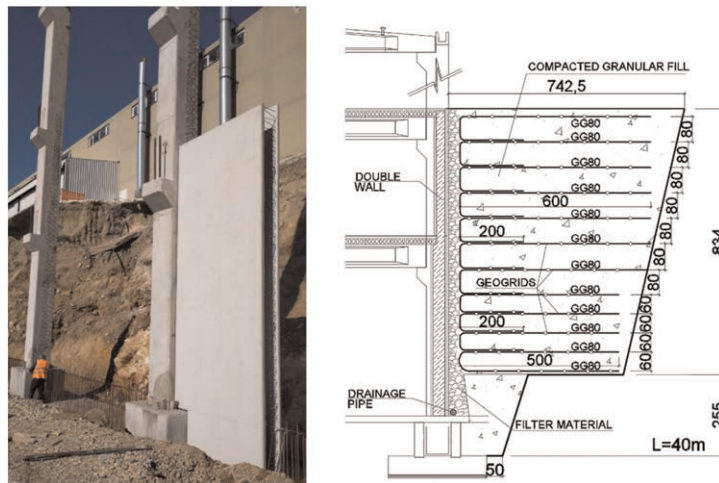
Typical view and cross section of the factory walls which are also made with the double wall system and the backfill is reinforced with geogrid.
